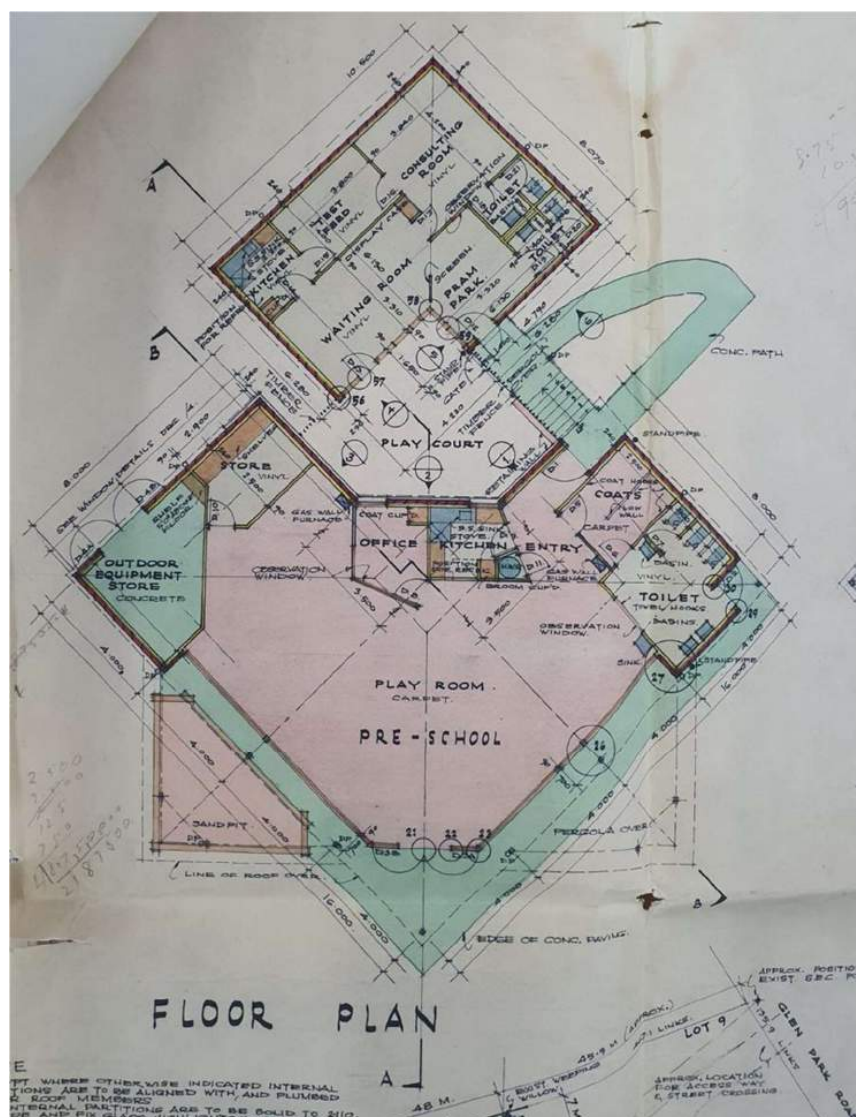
Plans by architect S C Horne for the Eltham North Preschool and Infant Welfare Centre, 1974. (PROV 1974, Public Building File - top and Public Building Plans - bottom).
